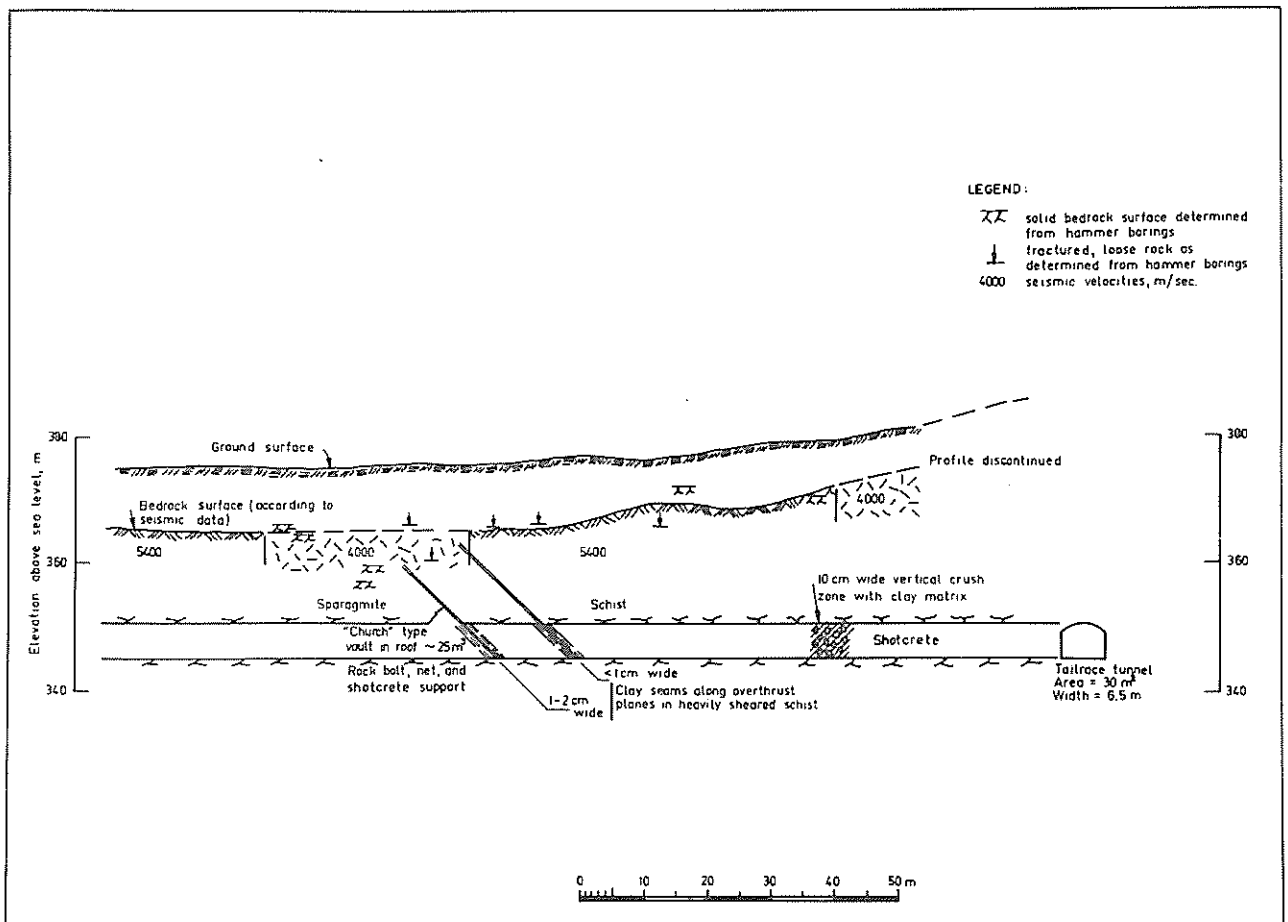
Bergvattnet tailrace tunnel. Bedrock weak zones in downstream section.
